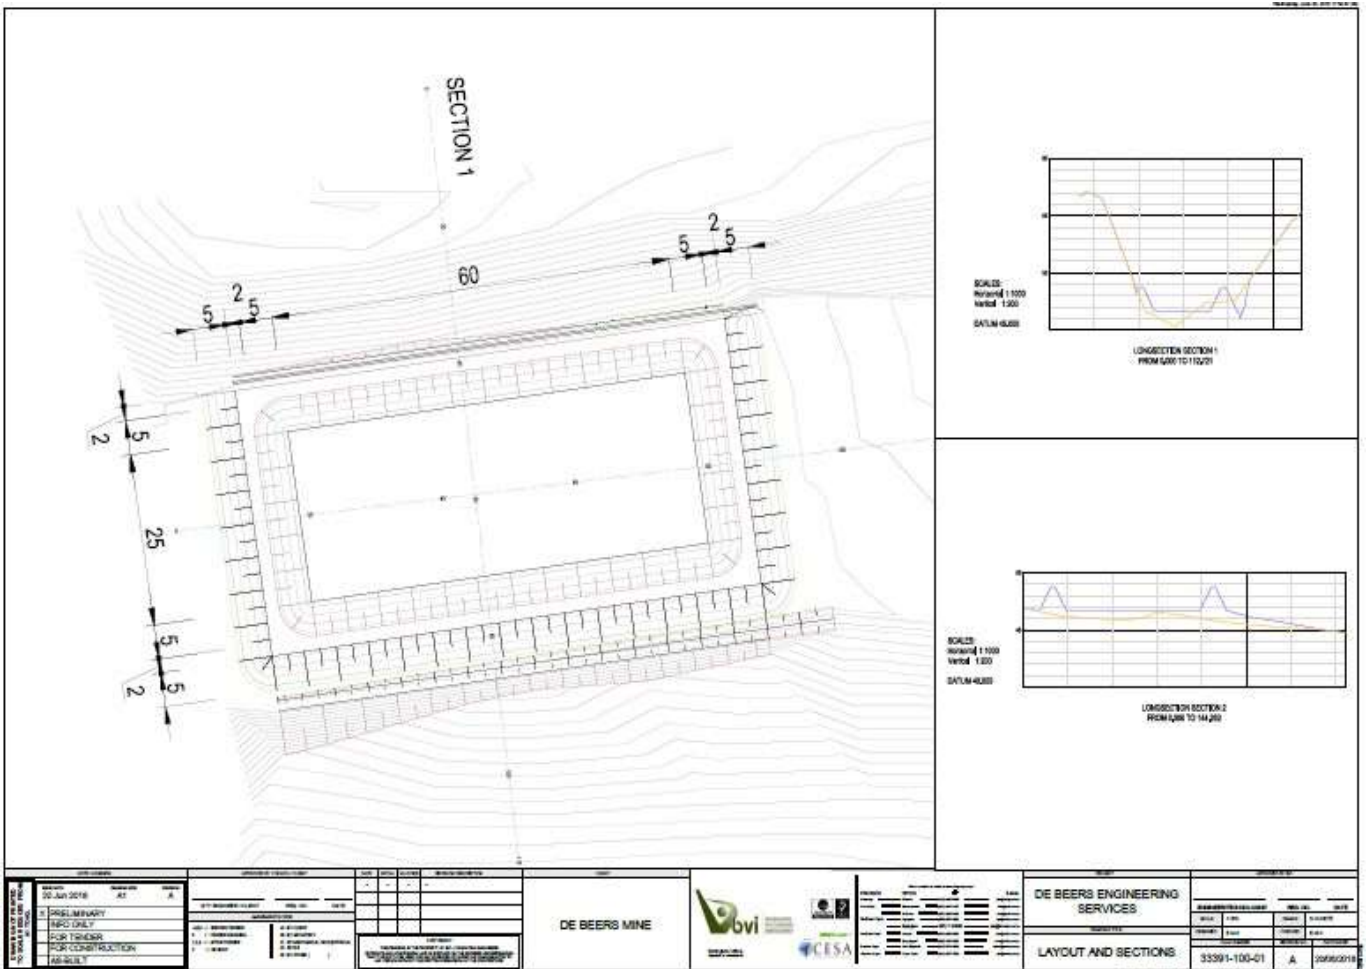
Design drawing for the proposed asbestos waste disposal site to be constructed within the Buffels Marine Mining Complex.
